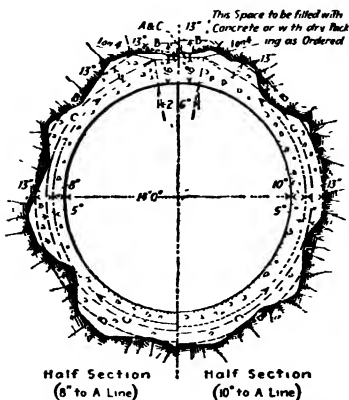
Concrete-lined pressure tunnel, Catskill aqueduct.
